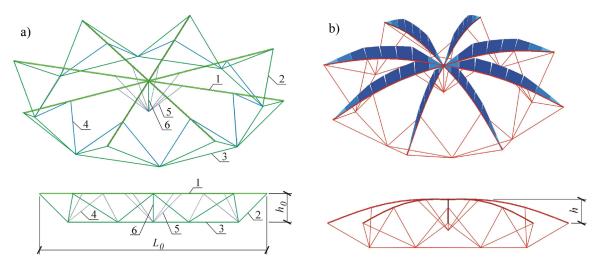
The frame of the structure. a – initial configuration; b – pre-stressed configuration, ready to bear external loads; 1 – beam of the upper chord; 2 – diagonal cable; 3 - circular cable; 4, 5 – outer and inner hinged struts; 6 – central tie
